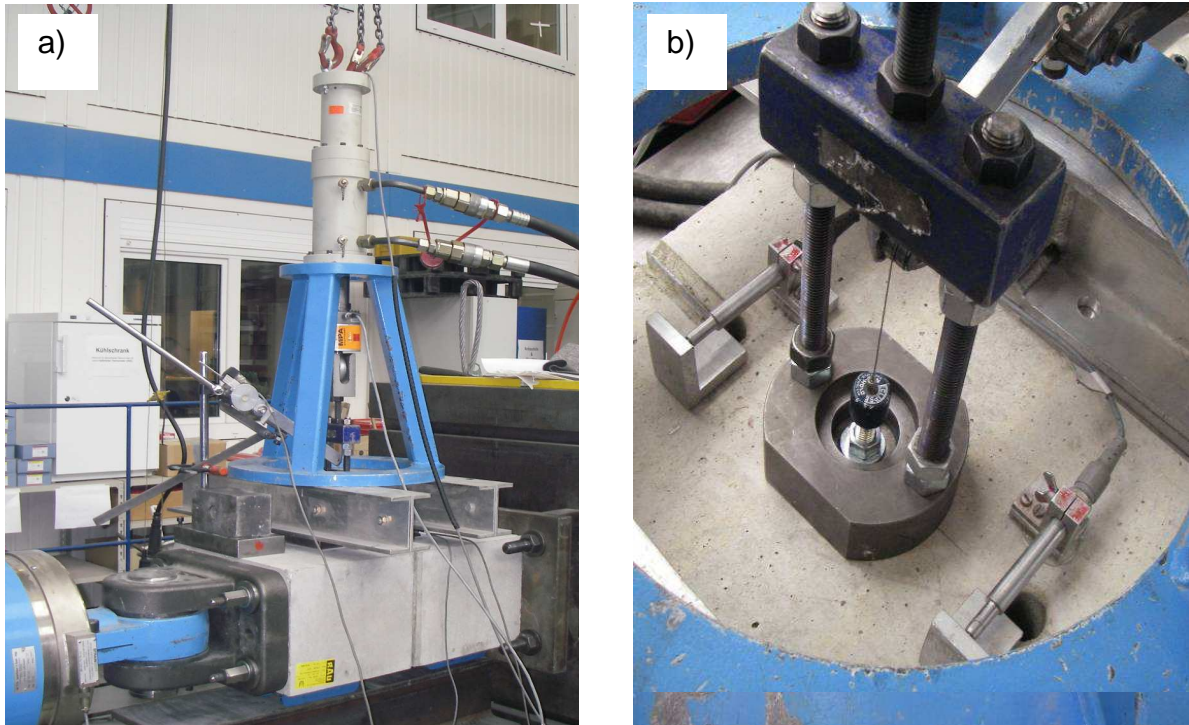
a) 50 kN actuator resting on special concrete specimen which is mounted between 630 kN actuator and abutment; b) Close-up of installed anchor, and anchor displacement and crack width transducers
